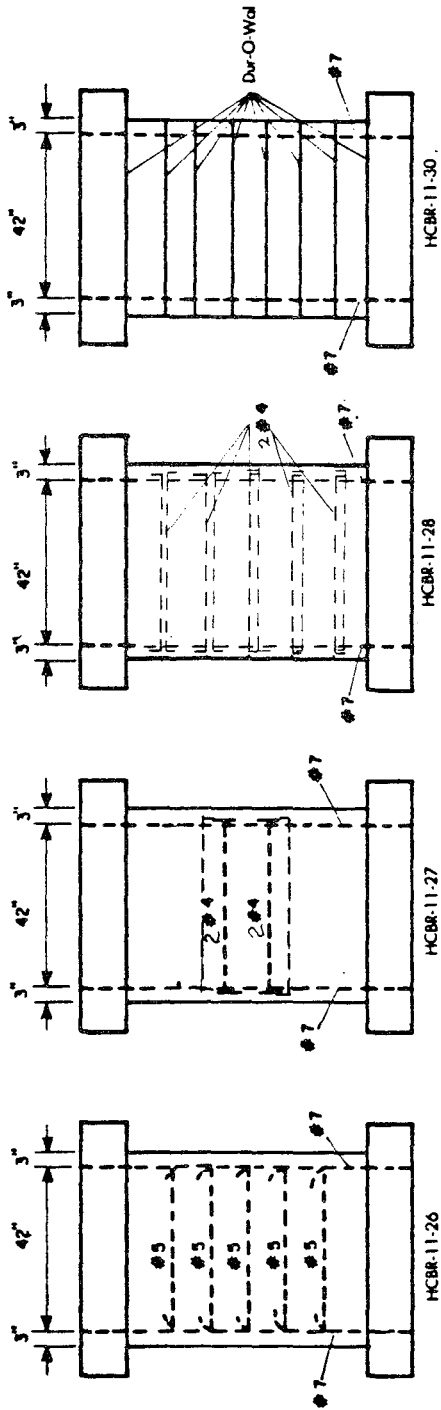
(b) (CON'T.) REINFORCING STEEL ARRANGEMENTS FOR HOLLOW CLAY BRICK PIERS (HCBR)
